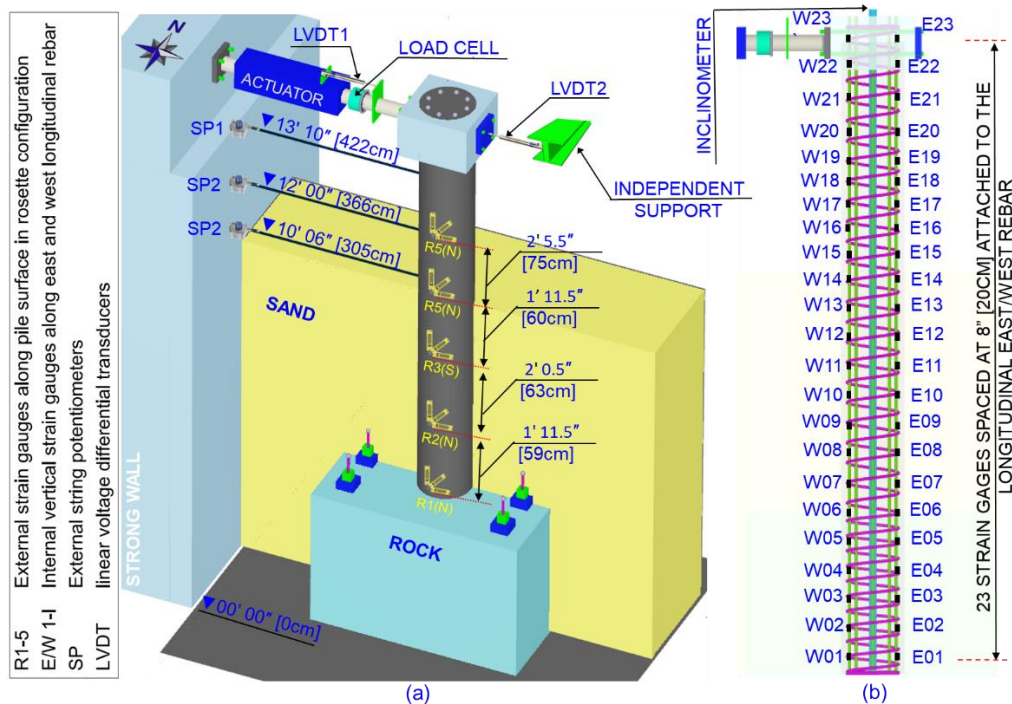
Instrumentation layout for Specimen 1: (a) External sensors; and (b) Internal sensors (tetrahedral sensors not shown)
